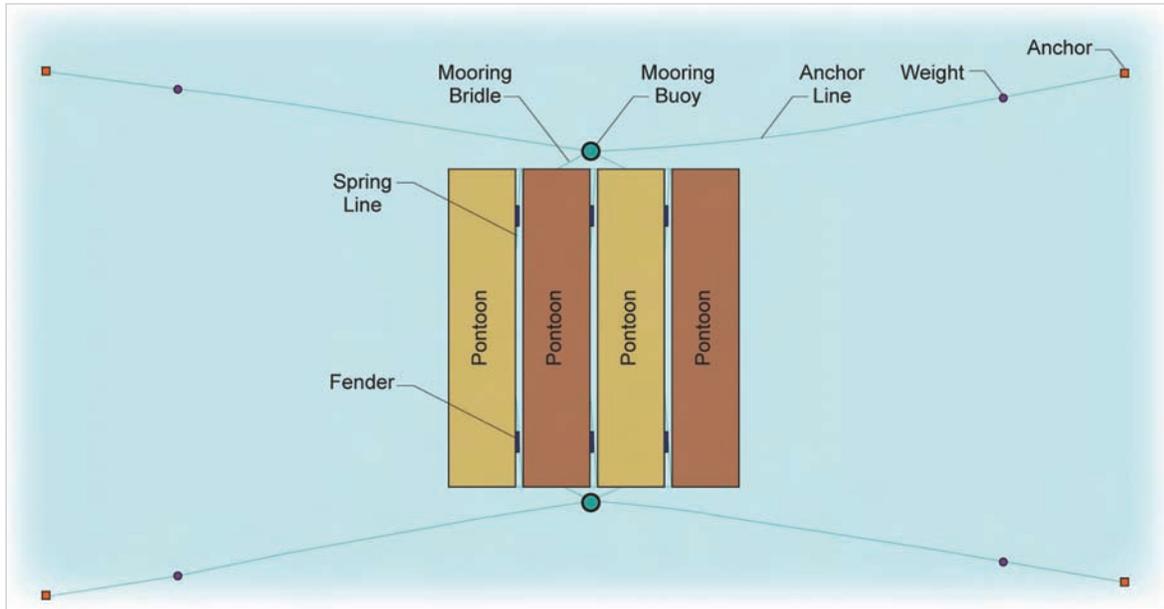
Arrangement of Pontoons during Open Water Moorage
